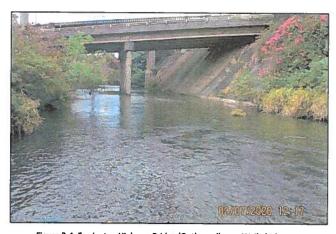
Farrington Highway Bridge (Outbound) over Waikele Stream
